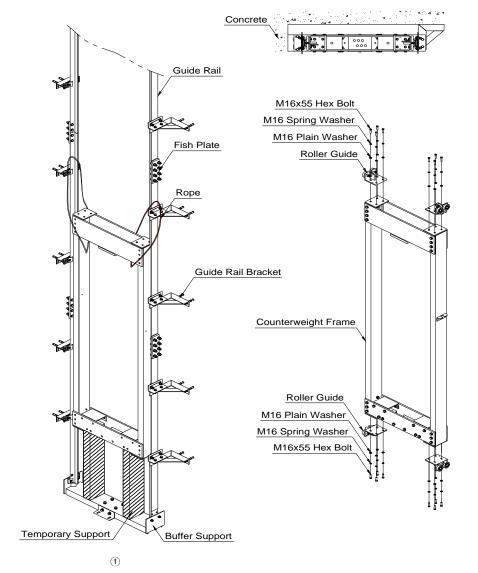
COUNTERWEIGHT FRAME INSTALLATION
